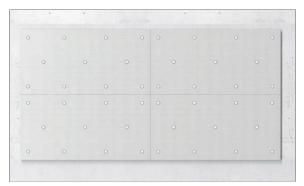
Board joints aligned. Fastener pattern (11 fixings per board)
